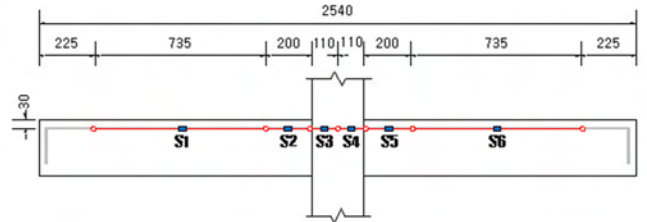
Location of LVDTs on the rebar (unit: mm)
